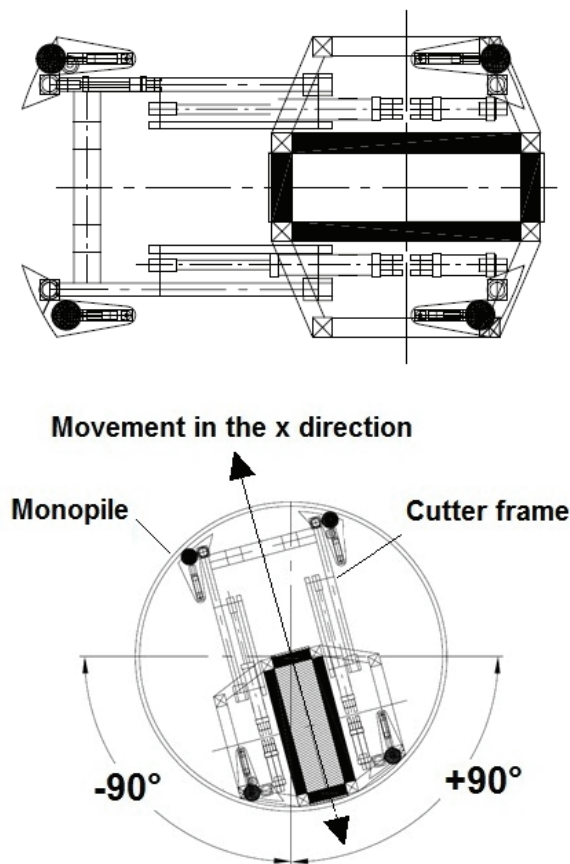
Guide frame and trench cutter for monopile support. The weight of this template is about 30 tons
